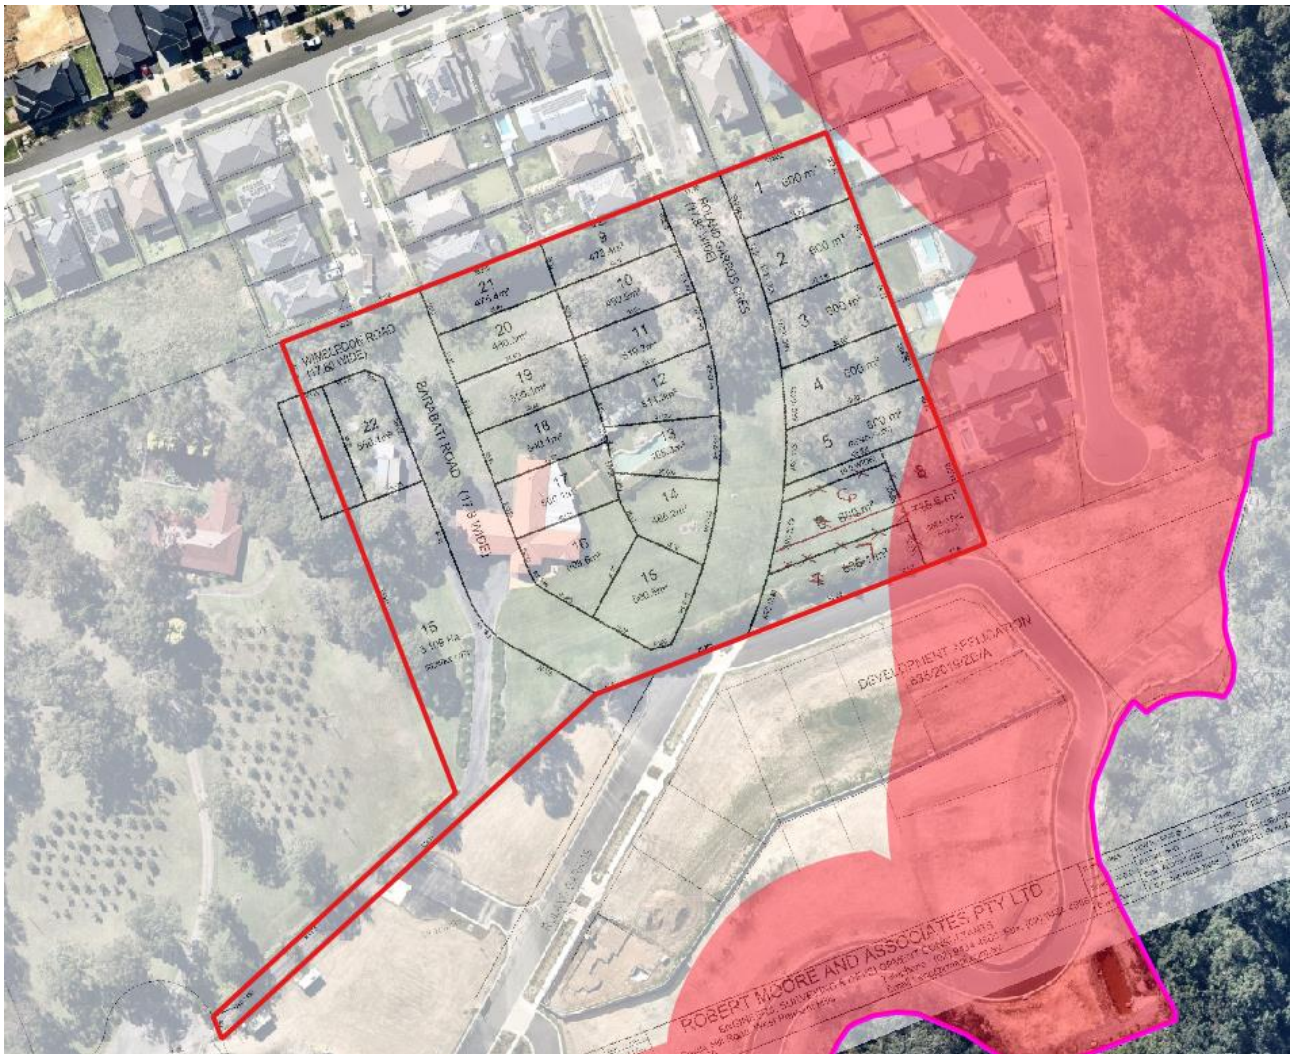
Aerial of the subject are overlaid with Conceptual Lot Layout and minimum required Asset Protection Zones
